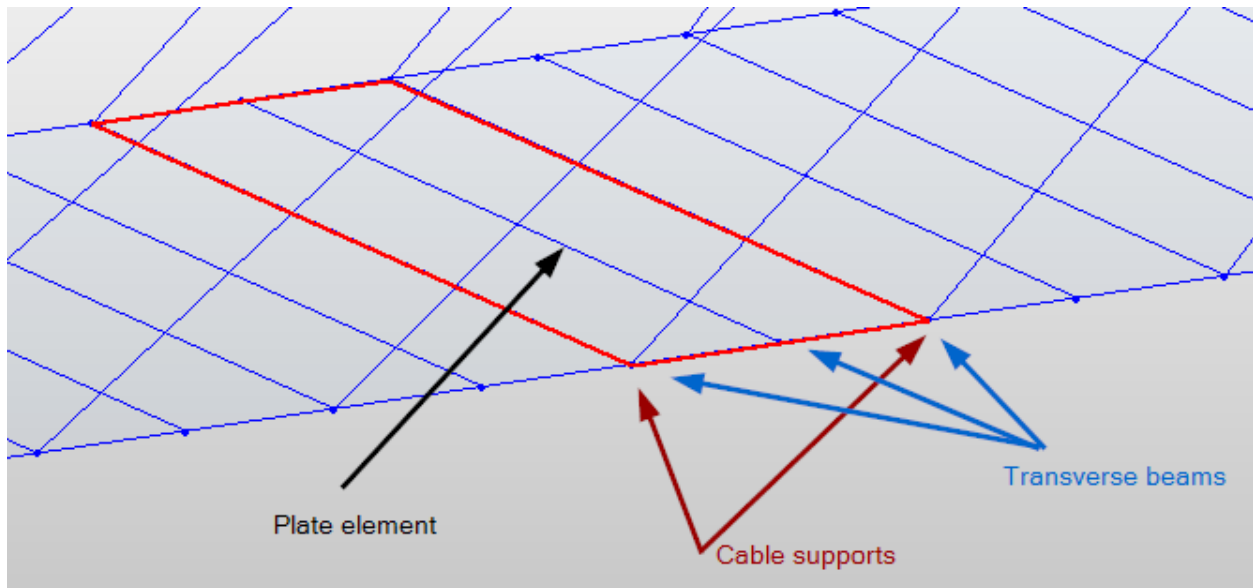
Detail of the deck idealization between cable-support regions, including plate elements, longitudinal steel girders, and transverse floor beams.
